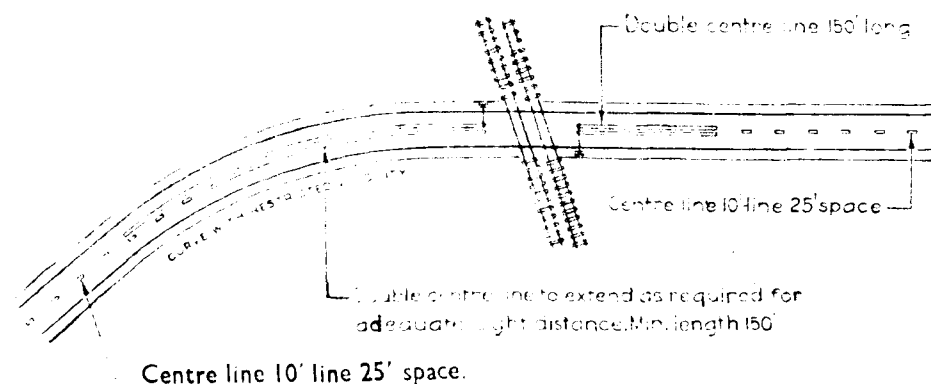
Line marking at railway level crossings provided with half Bow Gates
